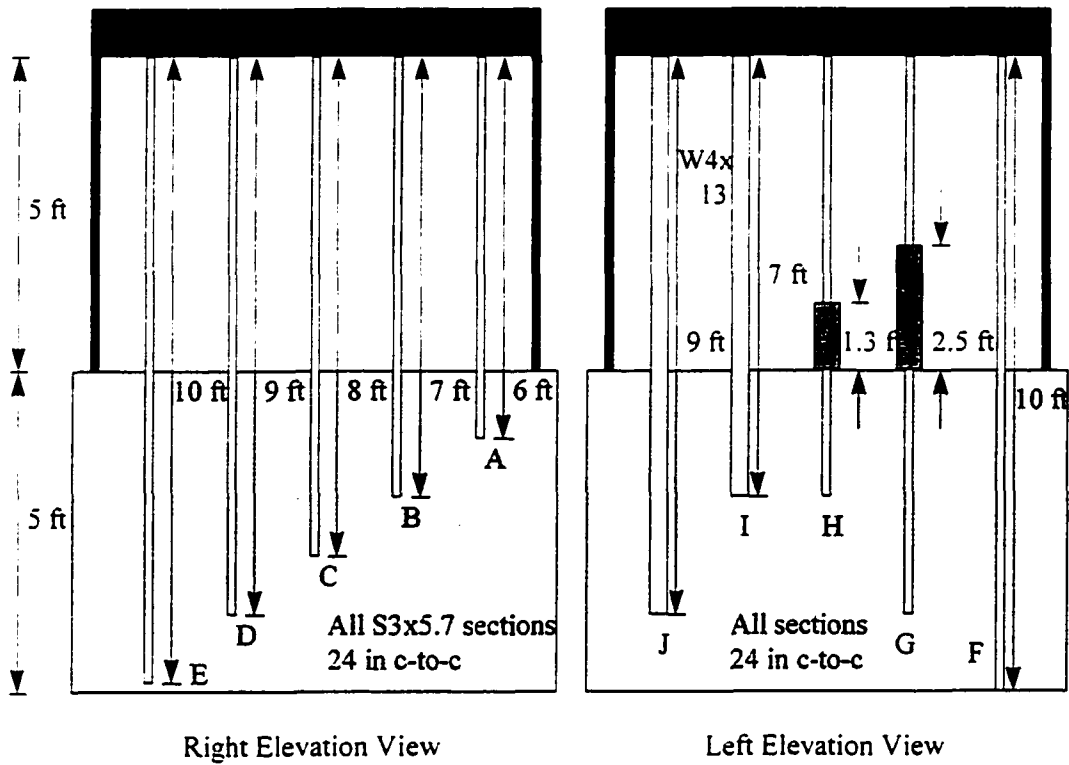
Elevation Views of Small-Scale Pile Test Facility
